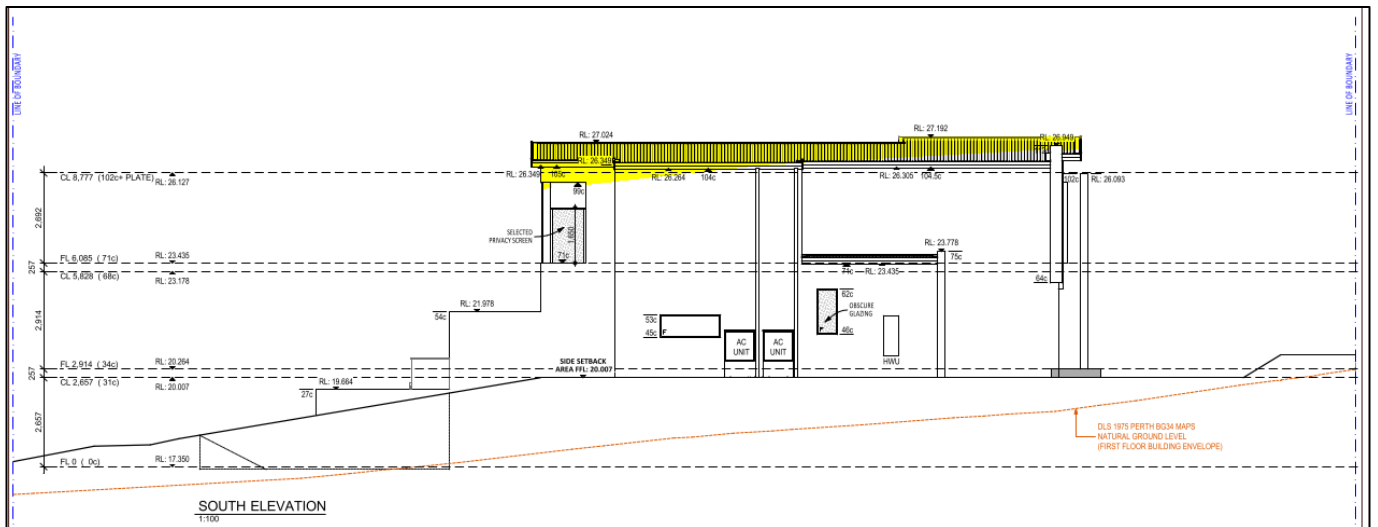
Diagram showing the over height portions of wall and roof from the southern elevation (highlighted yellow).
